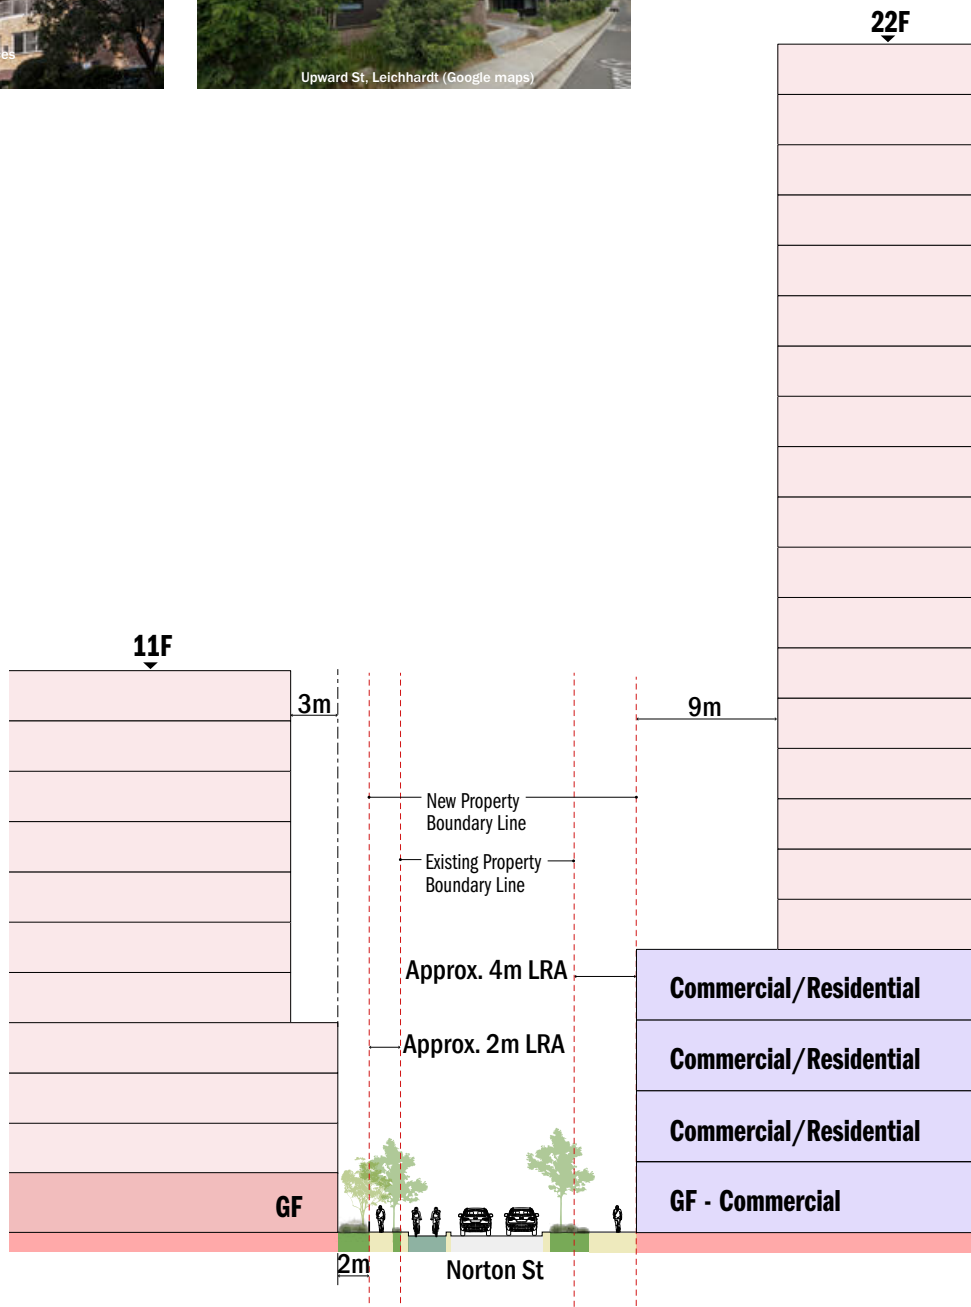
Section 3 - Norton Street (Knox to Holden Streets)
